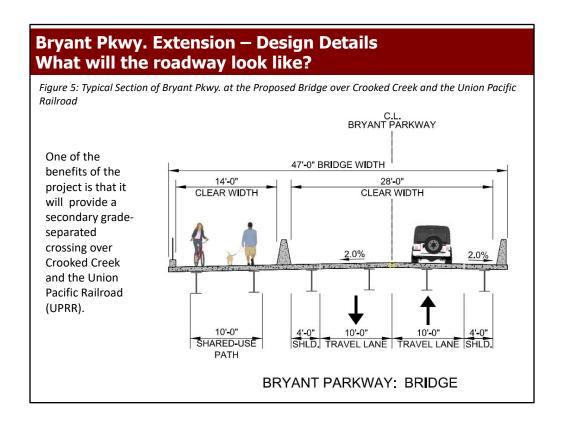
shows the proposed typical section for the proposed 700' long bridge over Crooked Creek and Union Pacific Railroad. This bridge will include 28' of clear width for motorists, and 14' of clear width for cyclists and pedestrians.
